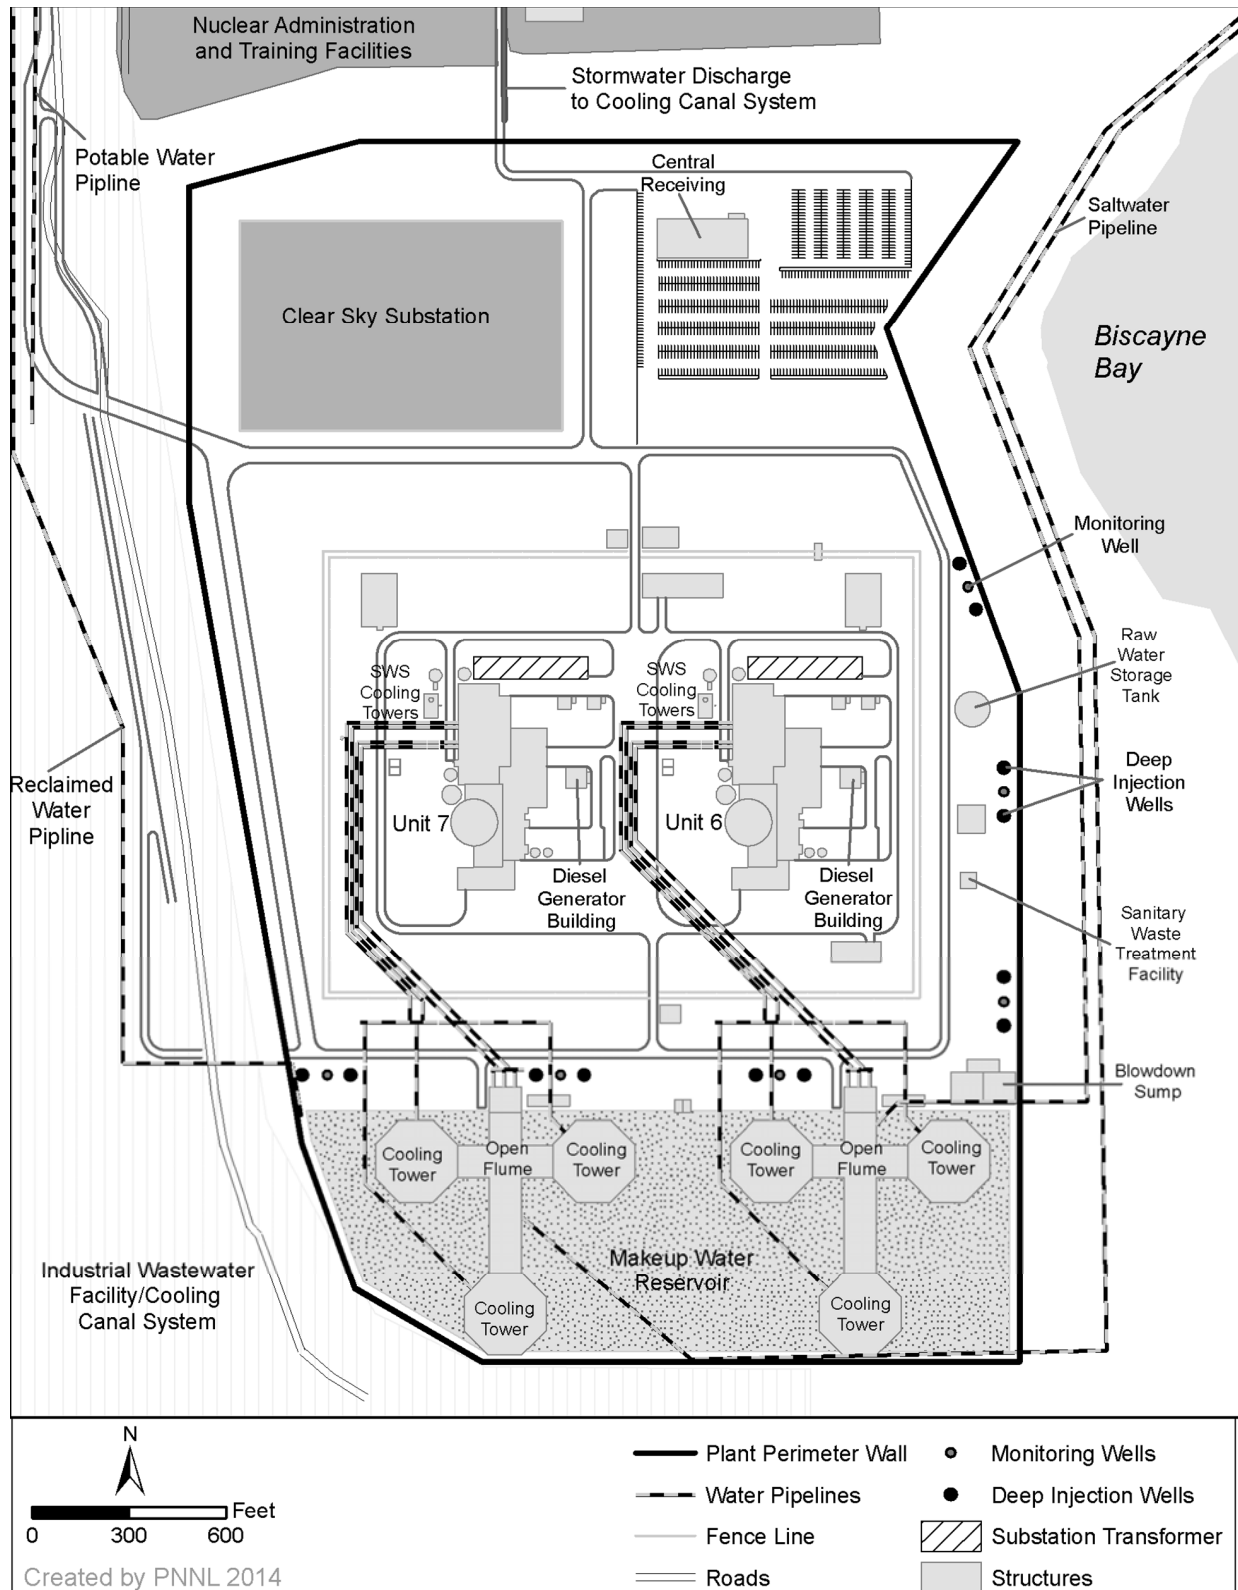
Turkey Point Proposed Units 6 and 7 Layout Detail
